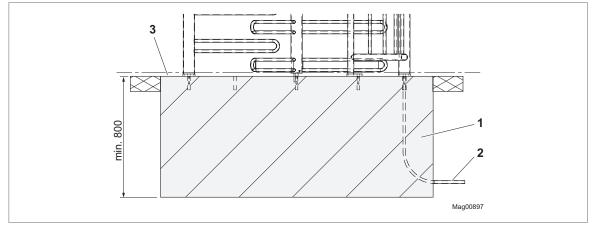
Foundation and empty conduit plan for base frame FURA T3 – side view (dimensions in mm)
